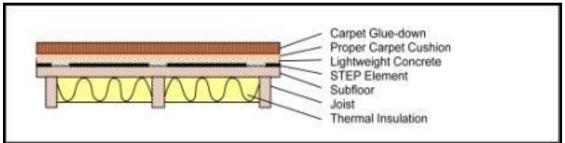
Installing Underfloor Heating Under Carpet (http://www.electricunderfloorheatingsystems.com/install-heated-floors/underwood.html)
